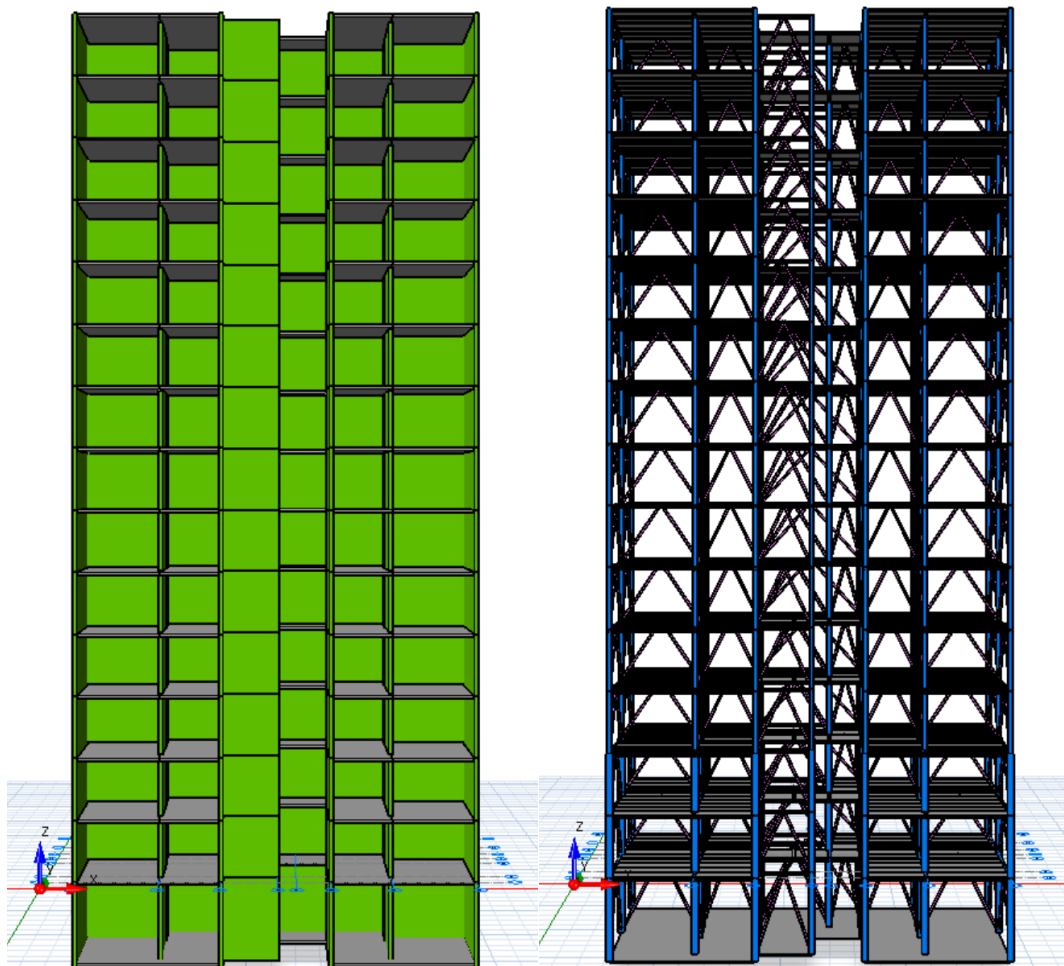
14-Story Reinforced Concrete Model (left) and 14-Story Steel Model (right)
